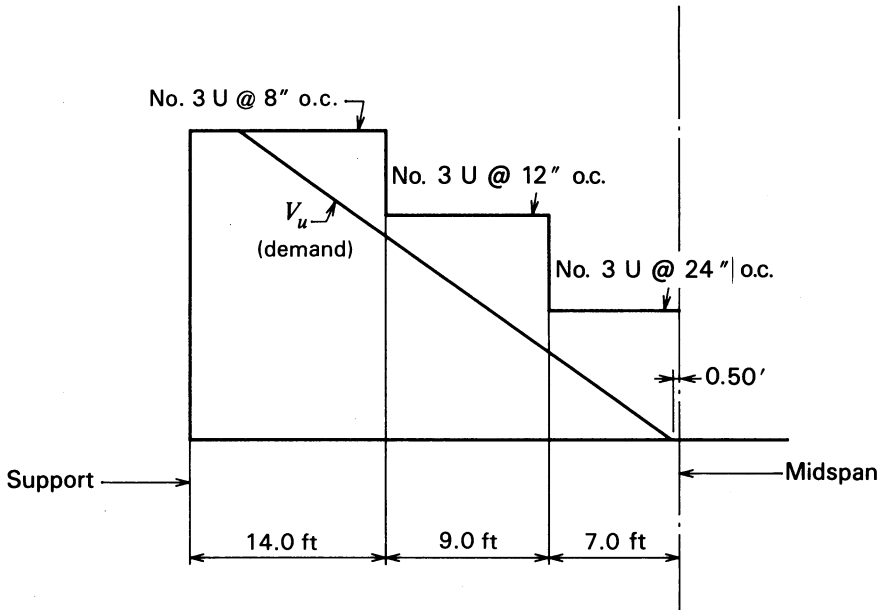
Spacing of no. 3 U-shaped stirrups for I.P. 6-5.
